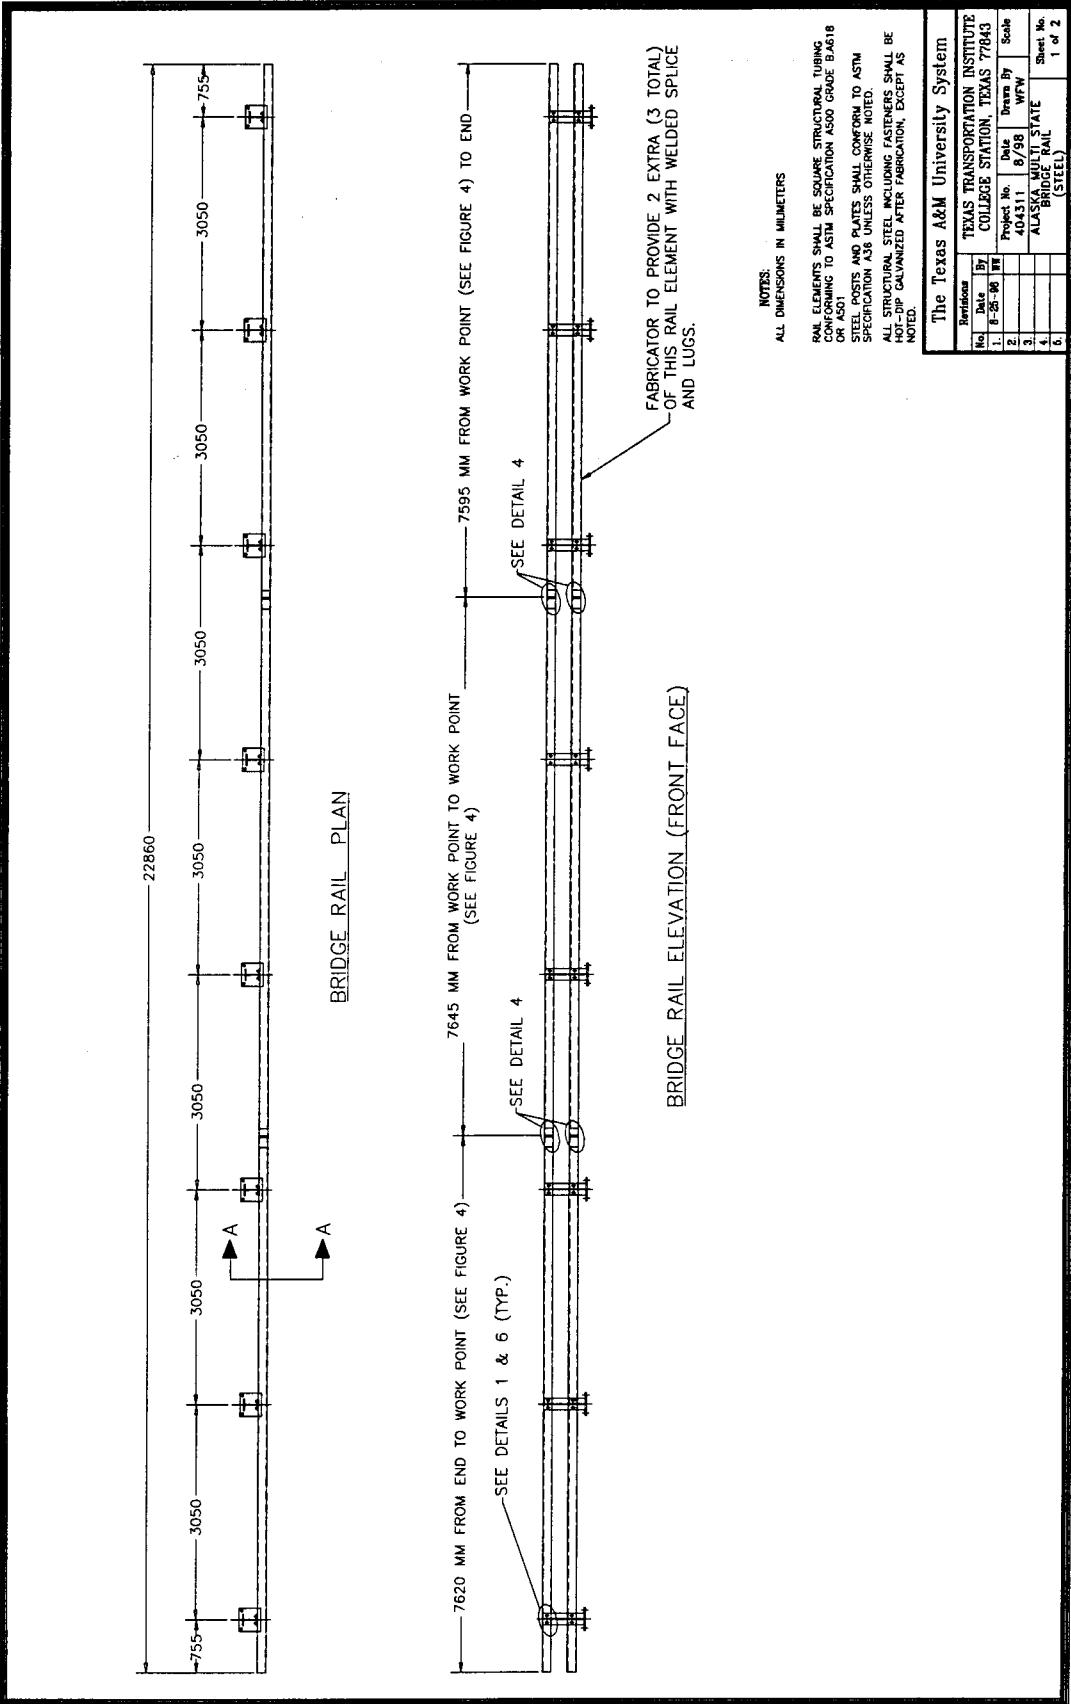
Details of the Alaska Multi-State Bridge Railing mounted on the curb (steel).
